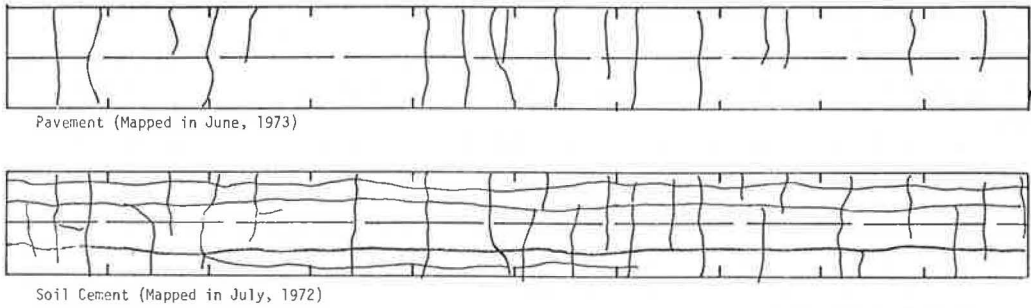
Cracking pattern of soil-cement base and superimposed pavement for experimental section with less cement and increased thickness.
